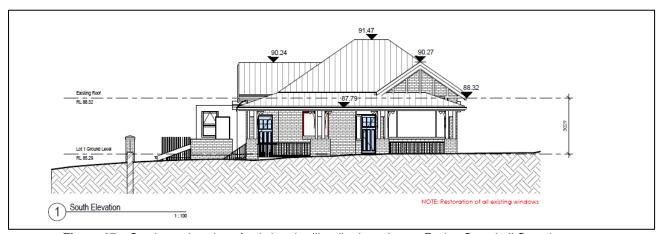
Southern elevation of existing dwelling (heritage item - Facing Campbell Street)
